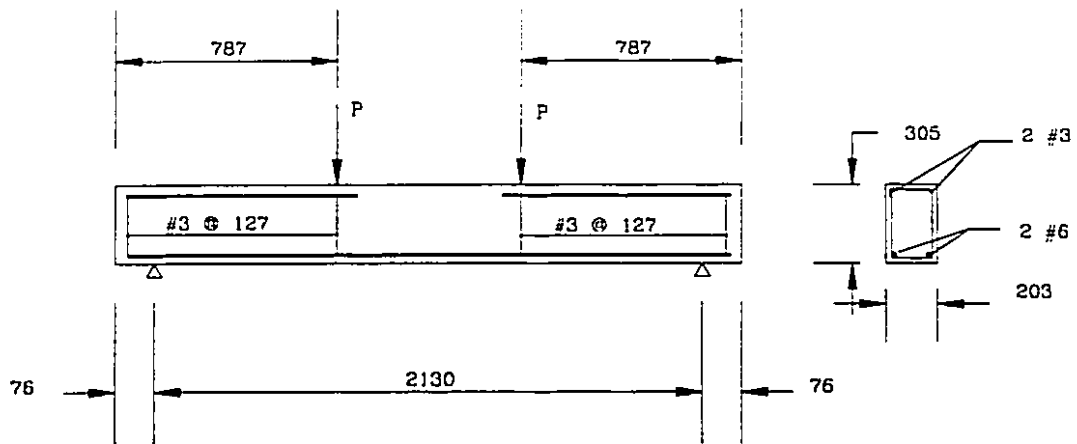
Geometry and Reinforcement Details of Beam LS1
